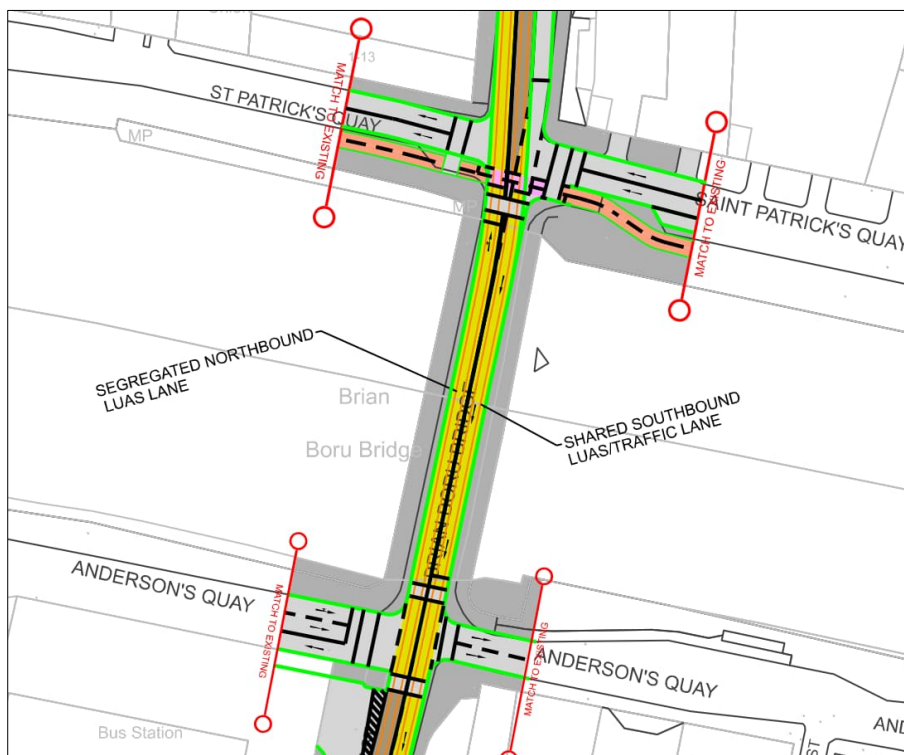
Brian Boru Bridge – Proposed Alignment
